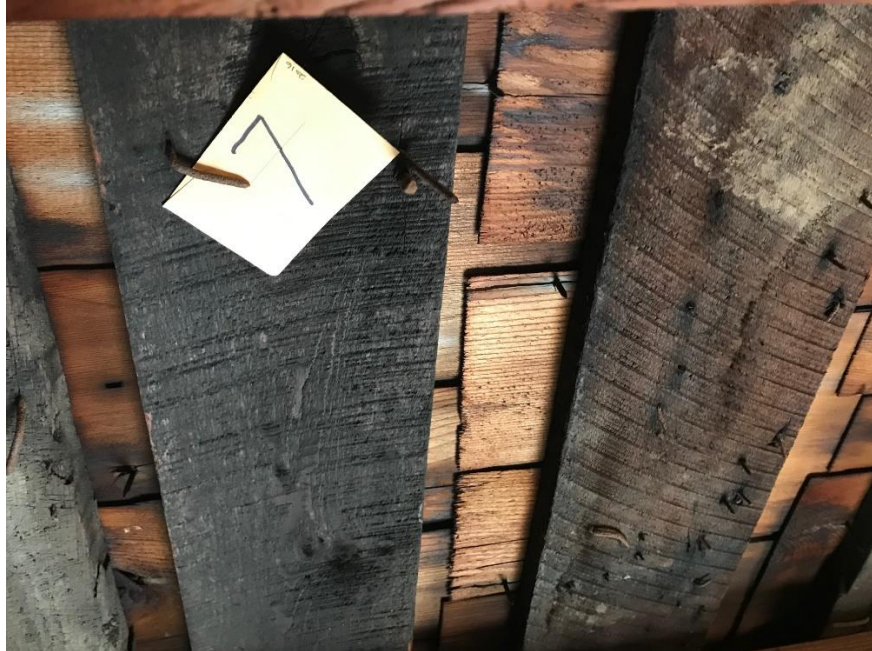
There are no ridge, boards, no collar ties and the rafter are deflected and sagging. Rake boards and rafter tails are sagging. The roof plane dips and undulates because it was underbuilt.
